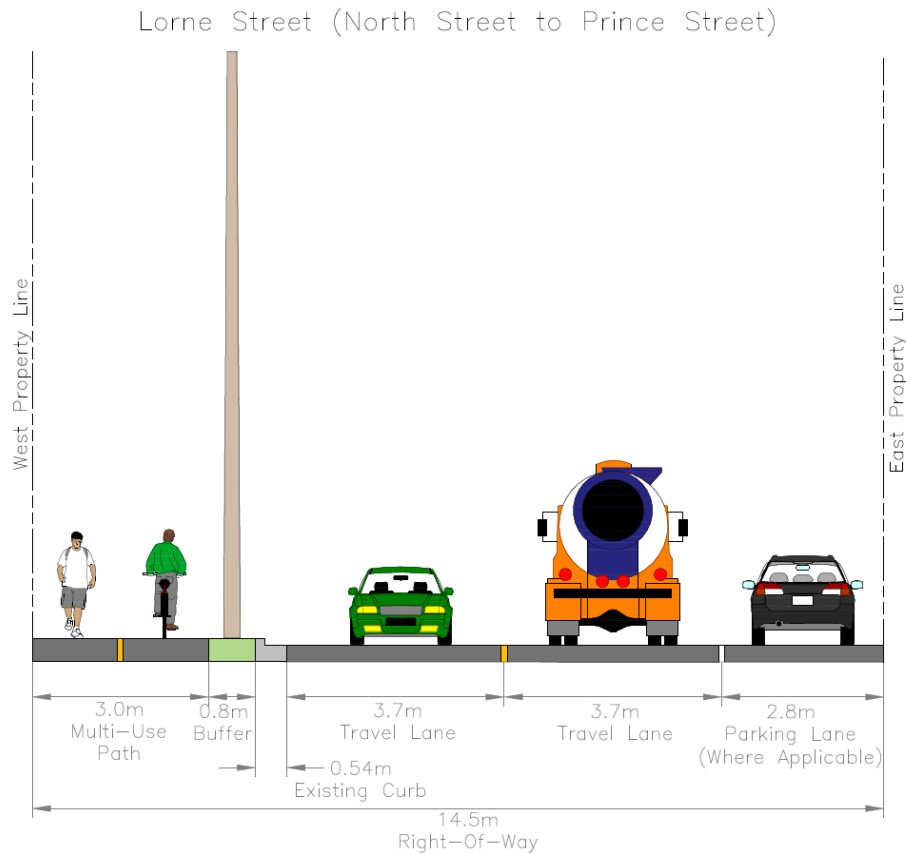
Lorne Street between Prince Street and North Street, Revised Cross Section
